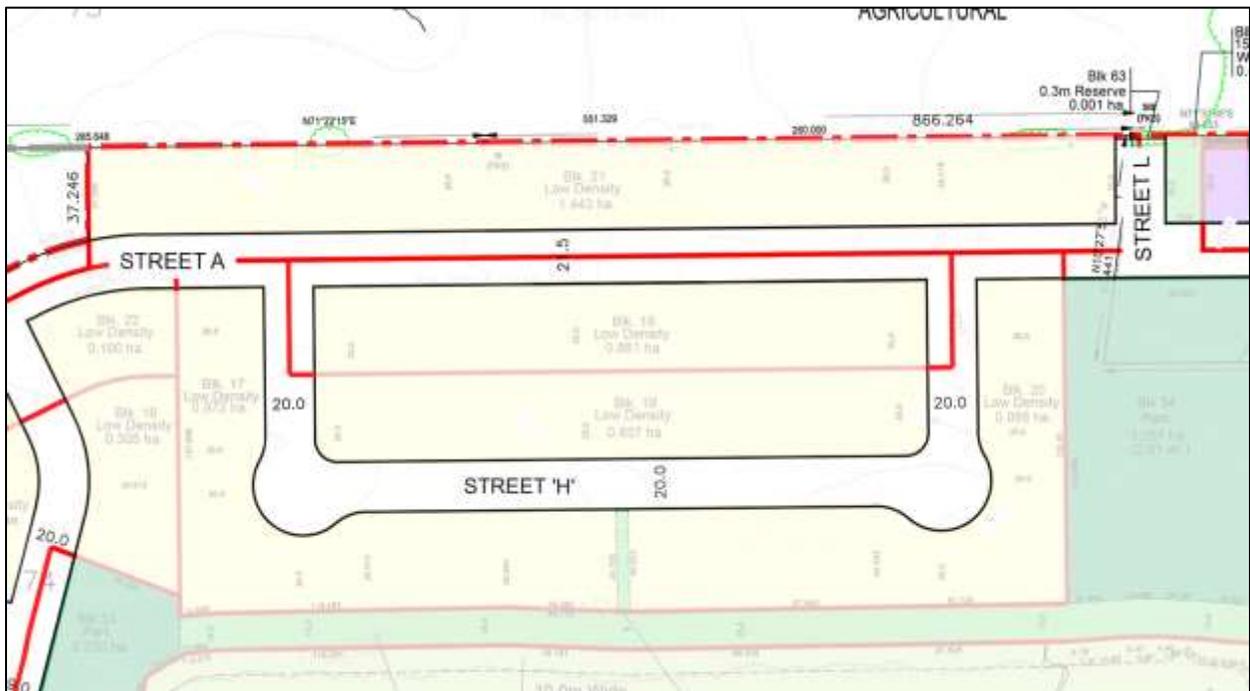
Streets H and L (local streets/neighbourhood connectors)
